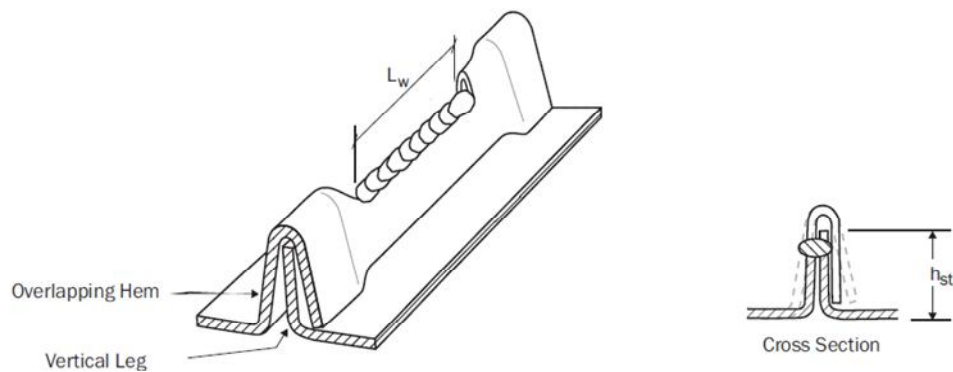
Standing Seam Sidelap Weld (AISI, 2016a)
